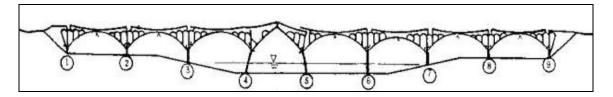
Damage sketch map for Yang Hua Zhuang Bridge
